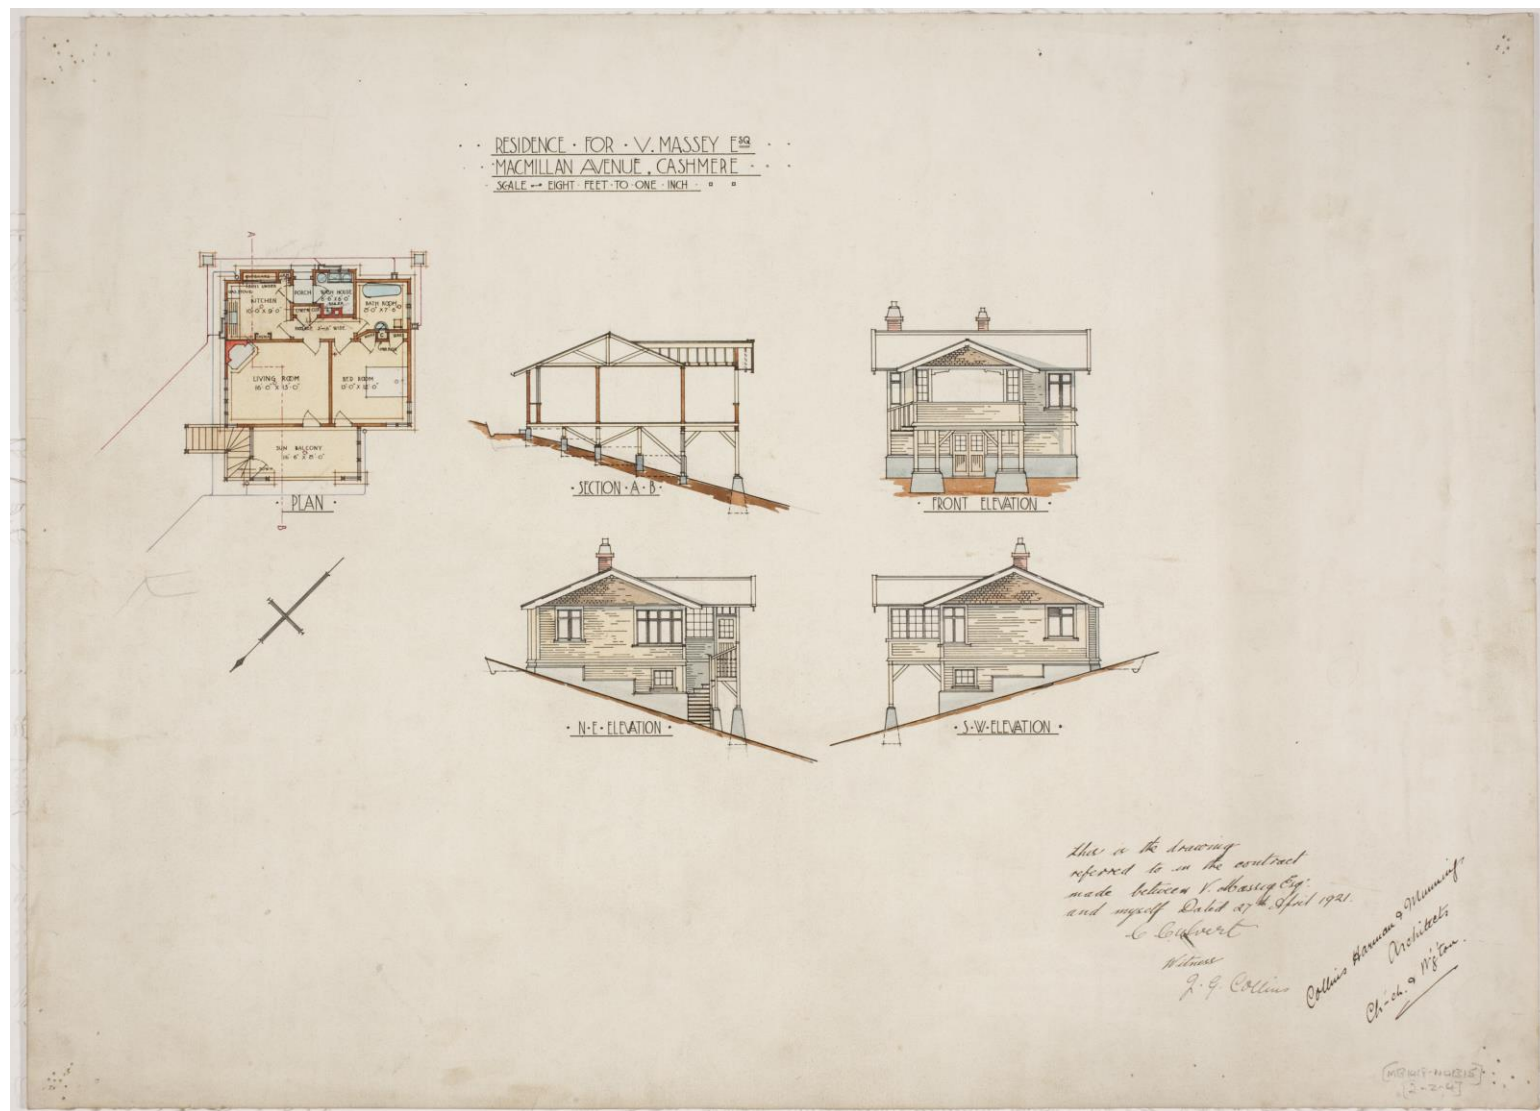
Collins and Harman, Residence for V. Massey, Esq., Macmillan Avenue, Cashmere, plan, elevations and section (1921).
